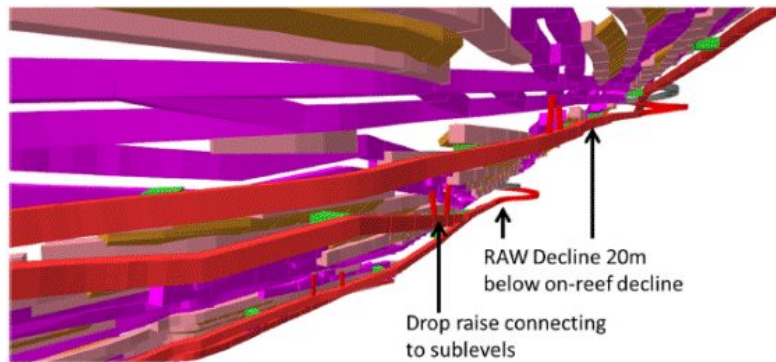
Typical Layout of BLR Mining Method (not to scale)
